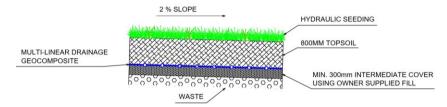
Lapouyade Landfill – Cross Section of the final cover design.
